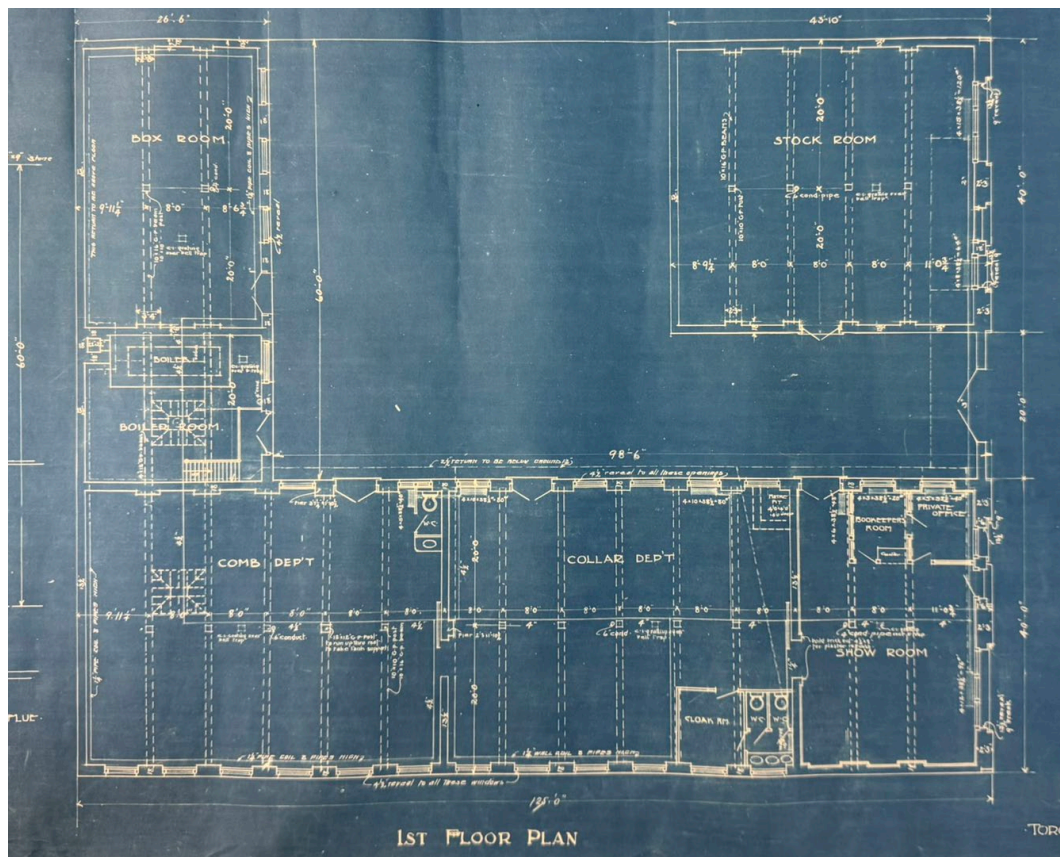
1st Floor Plan of the Arlington Co Factory on Fraser Avenue, prepared by Wickson & Gregg Architects in September, 1905.
